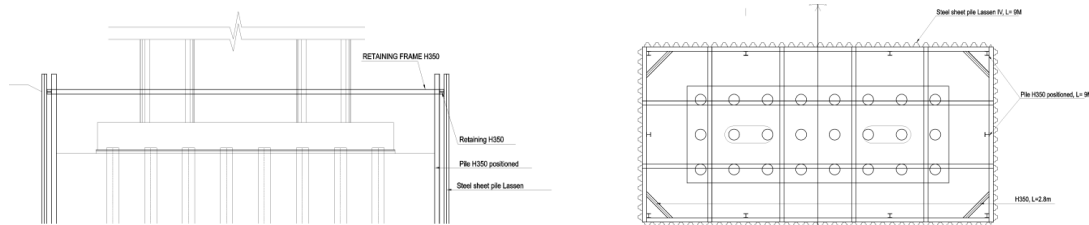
Schematic Diagram of Steel Sheet Pile Cofferdam
